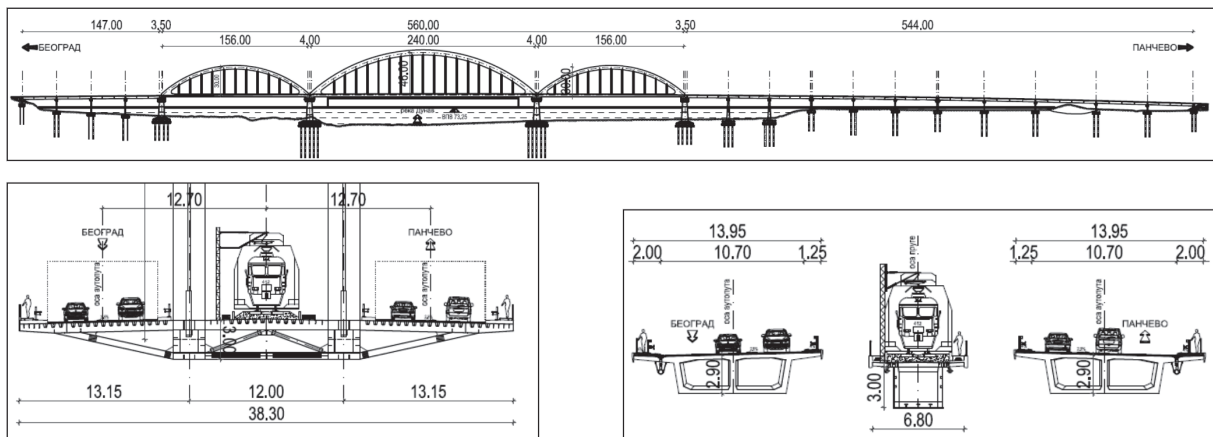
Railway-Roadway Bridge across the Danube at Vinča – Side View and Cross Sections [5]
